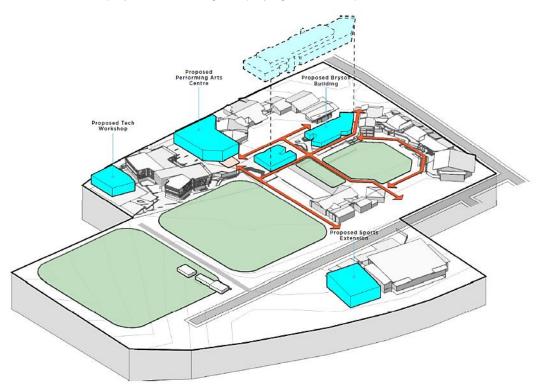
3D image of Concept Masterplan showing new buildings in blue (Source: PMDL)
